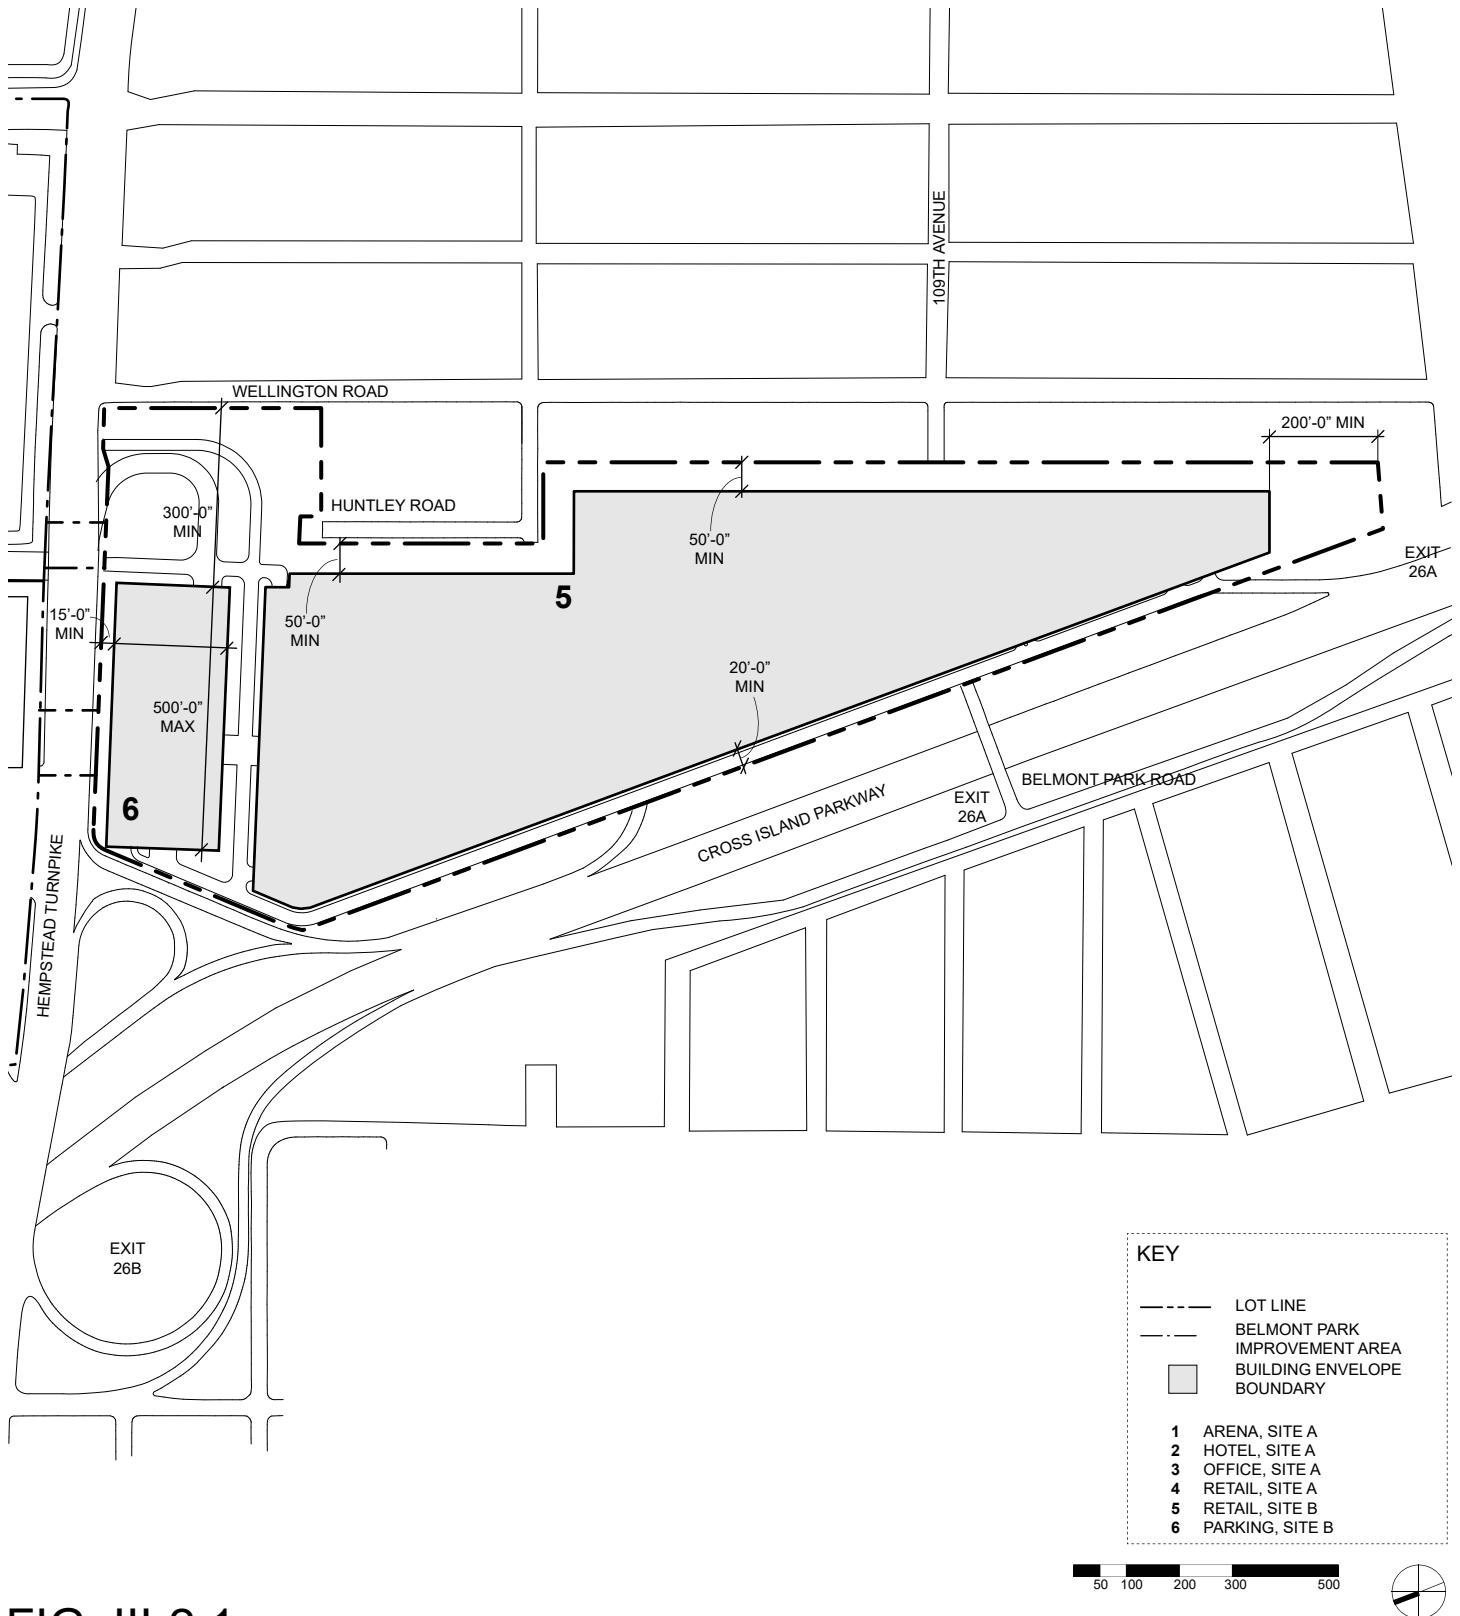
BUILDING ENVELOPE BOUNDARIES - SITE B
